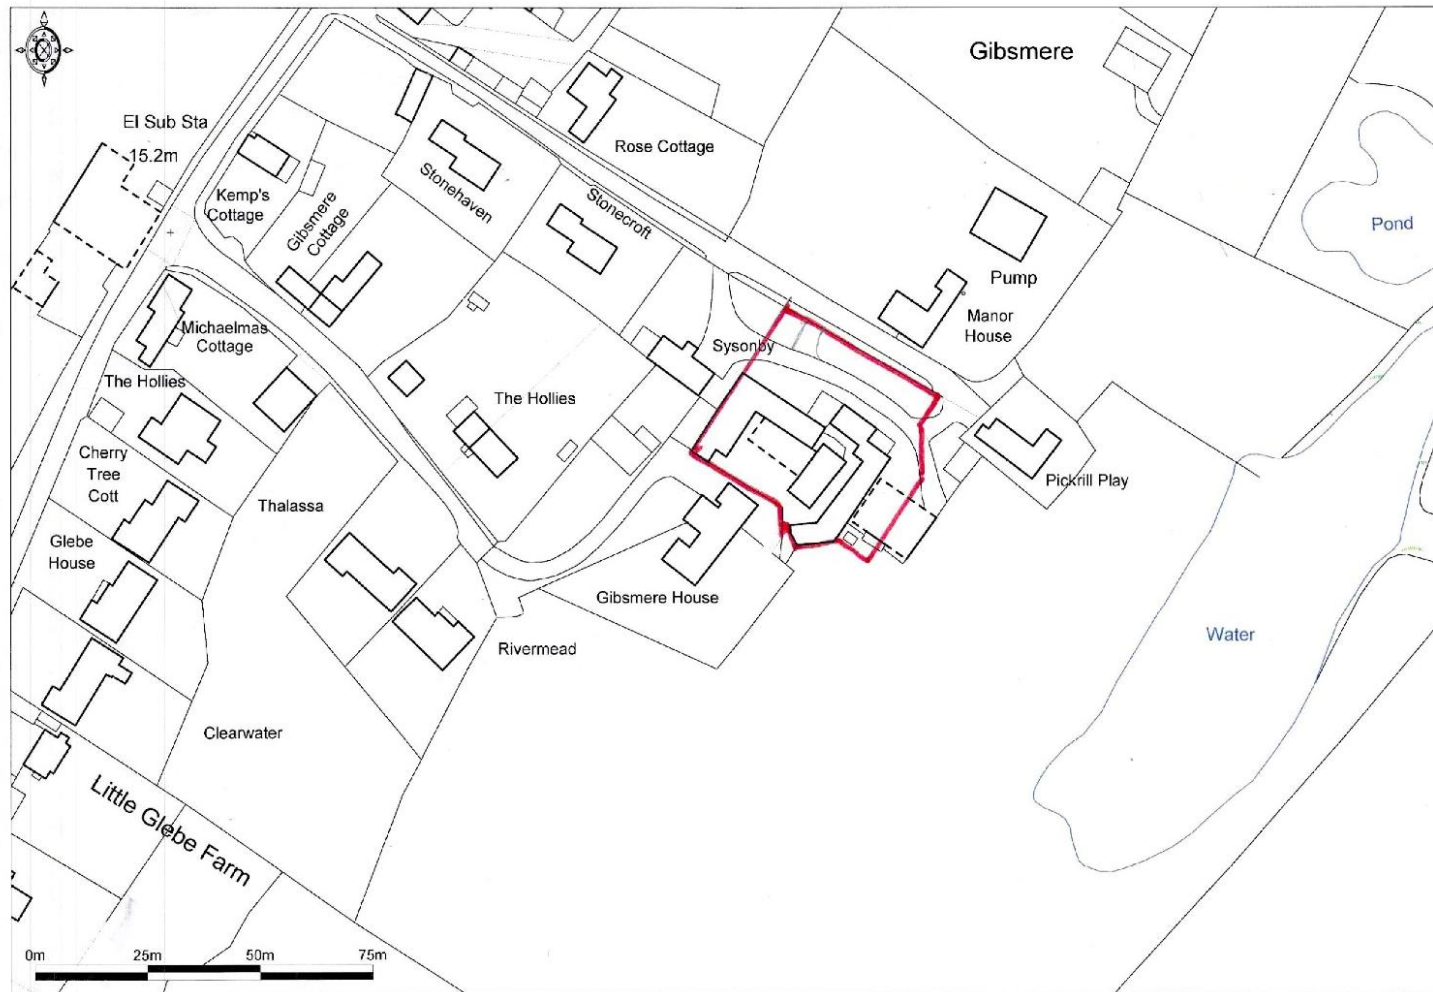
Barns at Gibsmere, Bleasby, Notts. Site location plan
